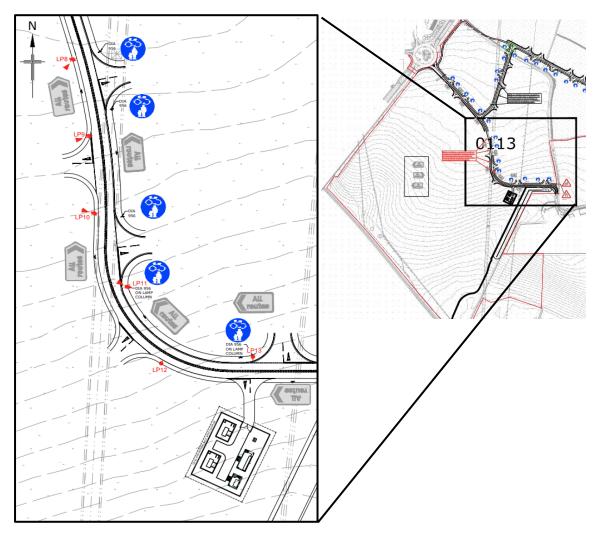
Highways signage at Plot 4000 junctions off Gateway Boulevard directing traffic towards A1120/A14 roundabout
